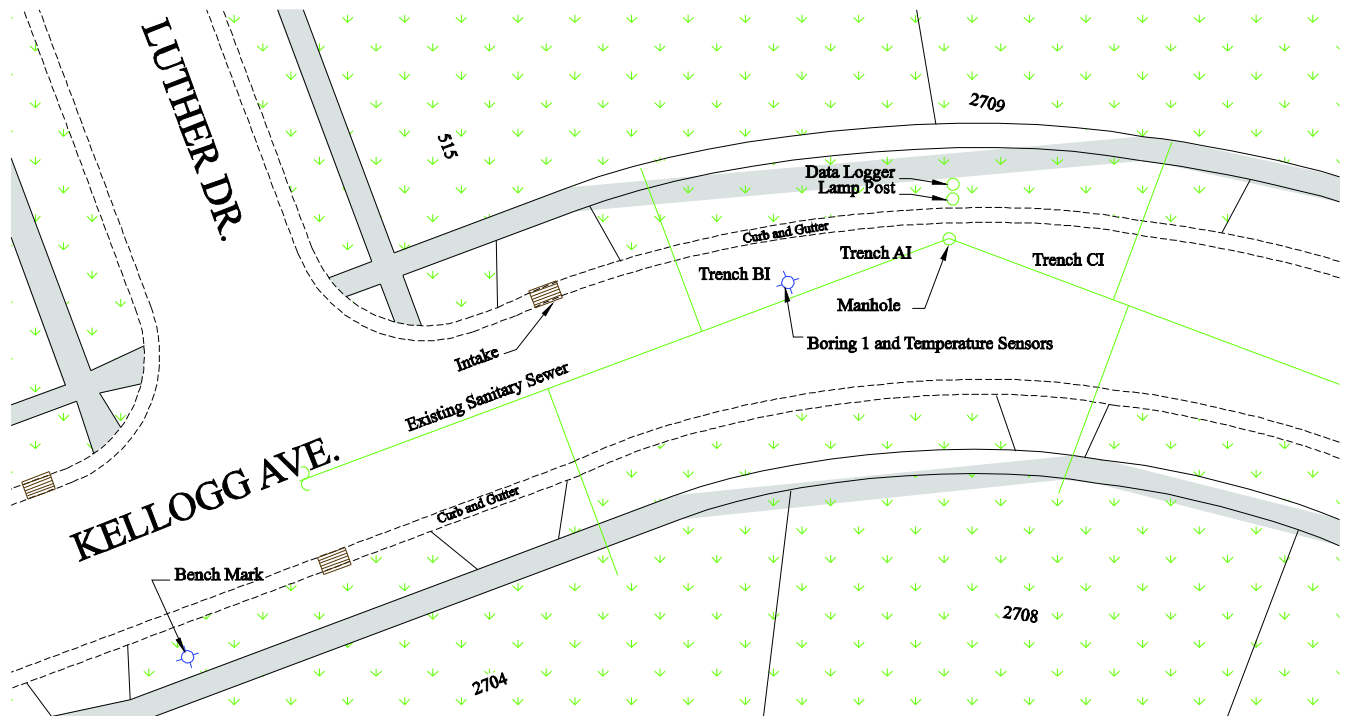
Plan view of the instrumented trench site showing the location of the trenches and the temperature sensors
